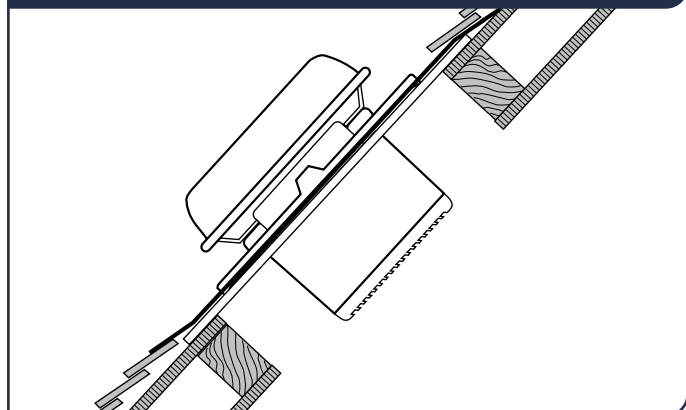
Typical Installation on Pitched Roof, Direct Ventilation
